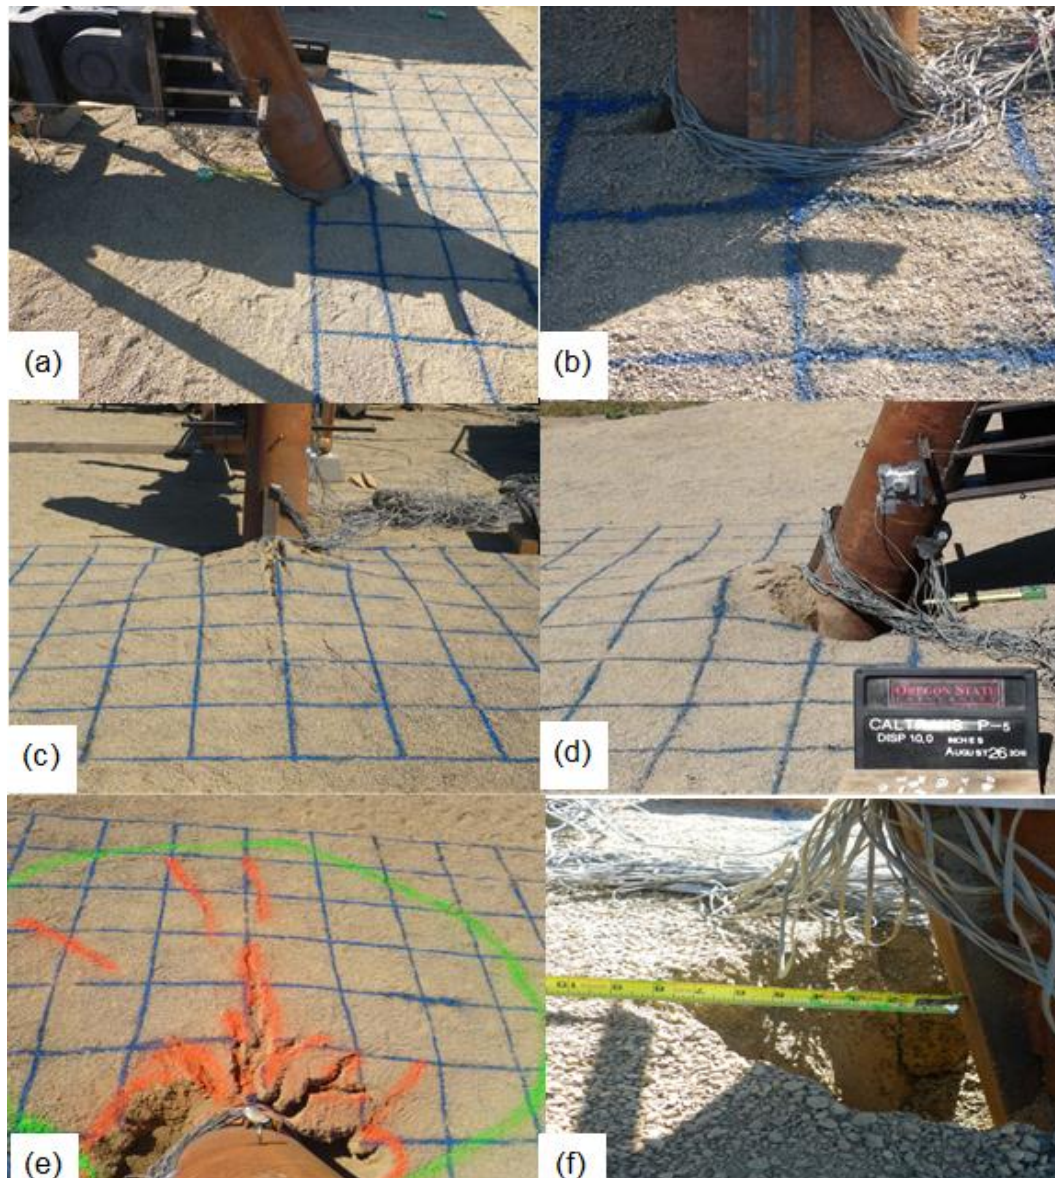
Observations during lateral loading testing of Pile P-5 (+26 Batter)
